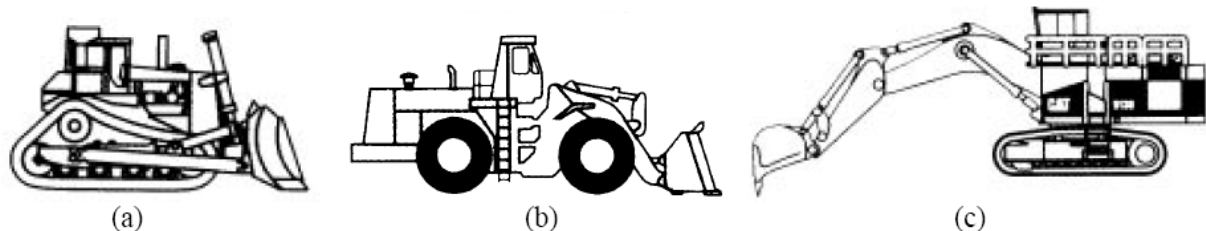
Three examples of machines for excavation and earthmoving: (a) bulldozer (b) wheel-loader (c) backhoe excavator, modified from Singh (1997).
